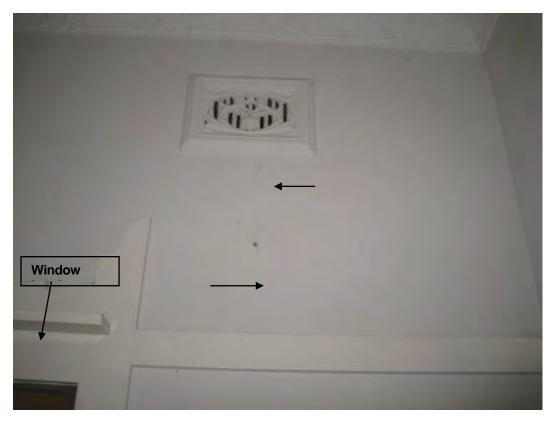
shows a vertical crack and separation crack between the cornice and the wall surface in the Kitchen
